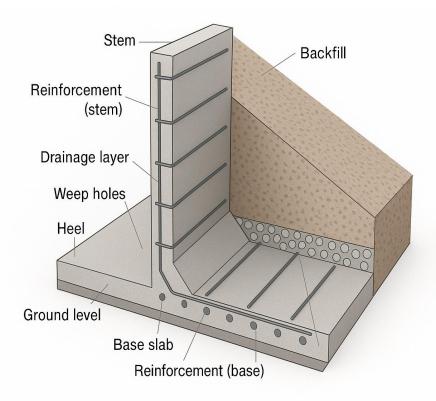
3D schematic of a Conventional RC Retaining Wall showing stem, heel, toe, reinforcement layout, backfill, and drainage (as per IS 12070:1987)
